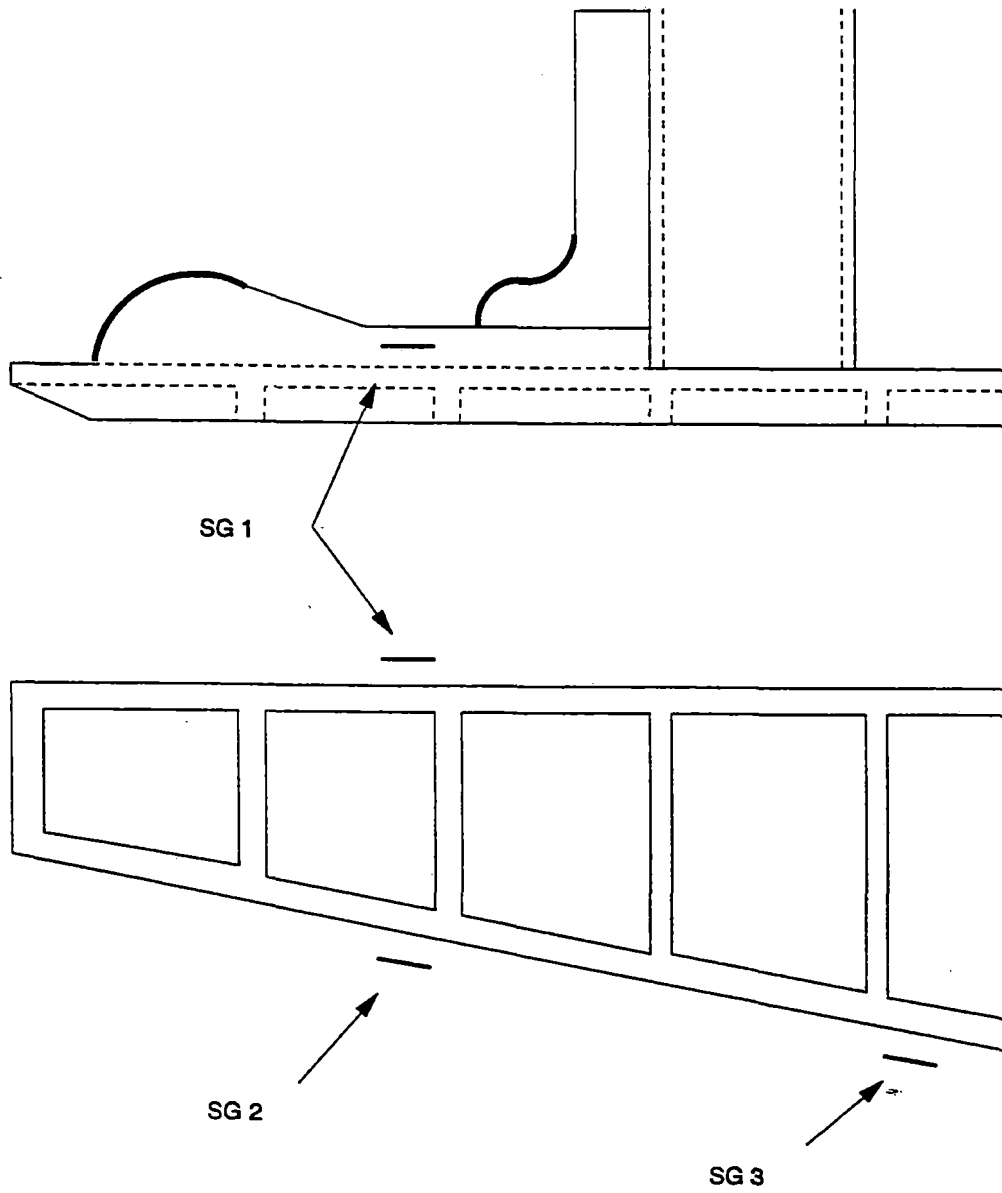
Detail G (of Exhibit A-2), Load Platform #1
